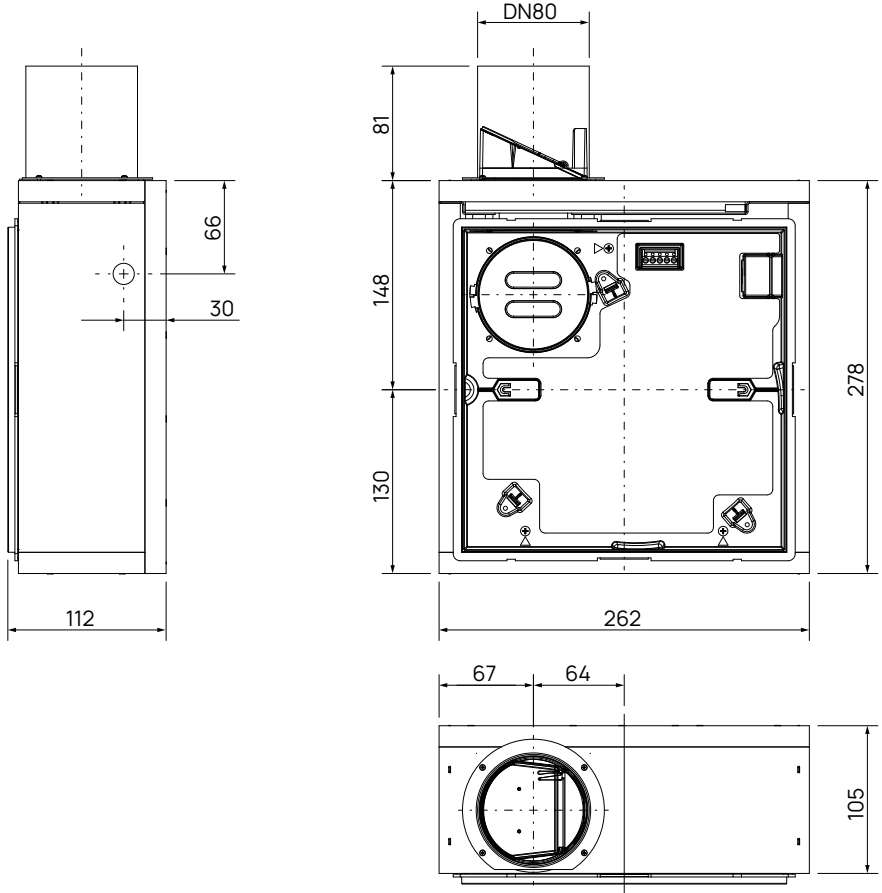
Dimensioned drawing – Taris extractor fan fire protection housing (BS)
